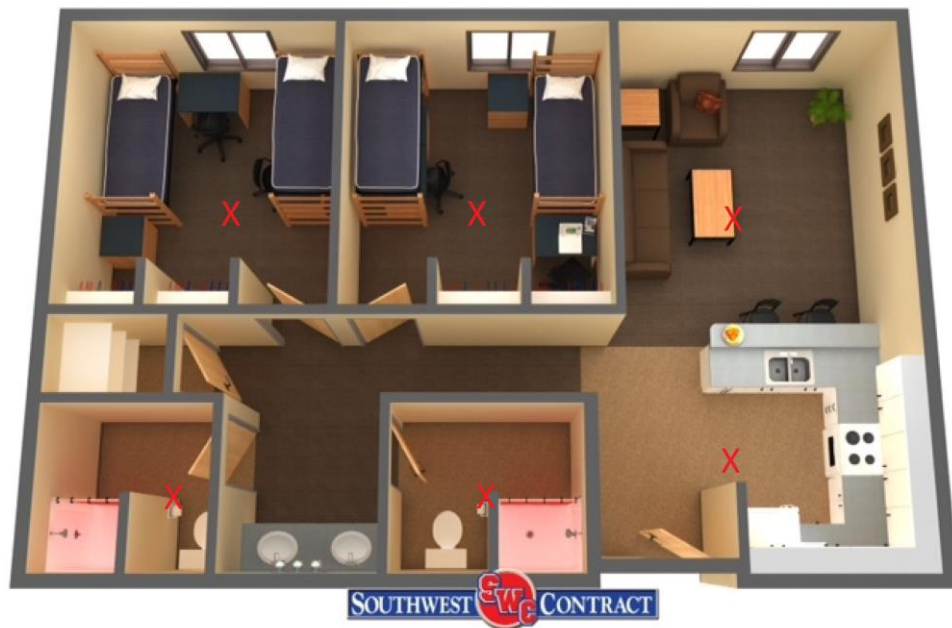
Crosswalk Commons Two Bedroom floor plan test locations
